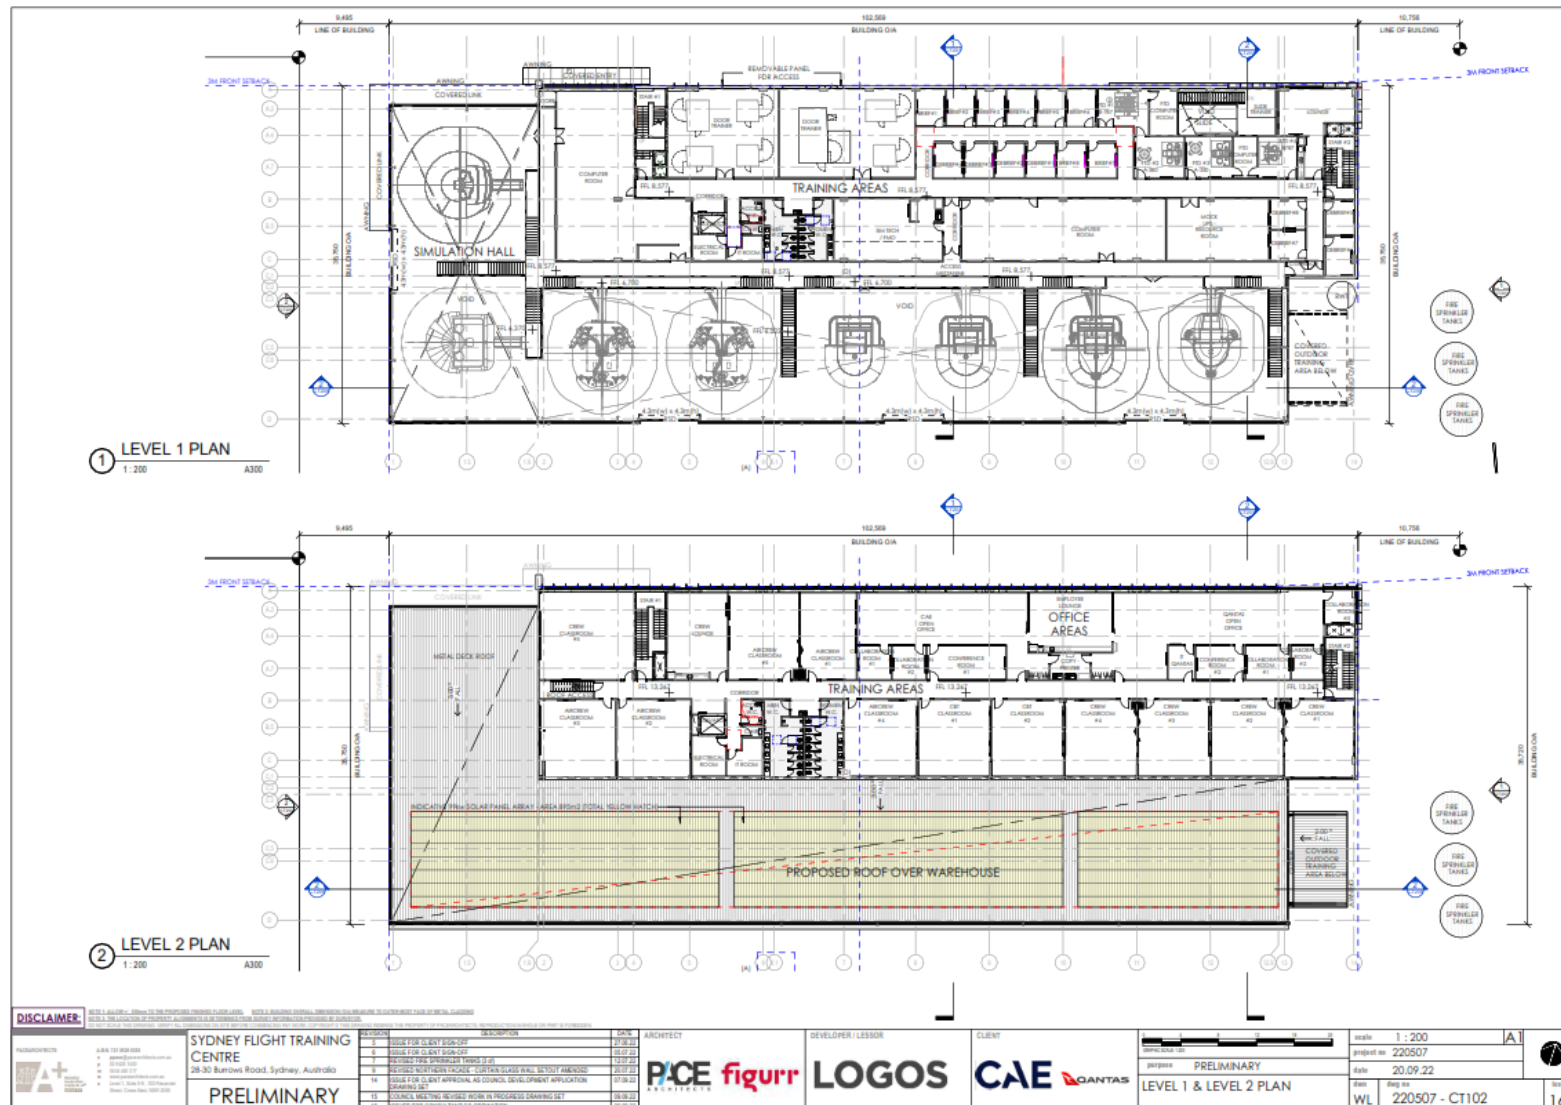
First and Second Floor plans of Sydney Flight Training Facility 28-30 Burrows Road. (Source: CAE and LOGOS, 2022)
